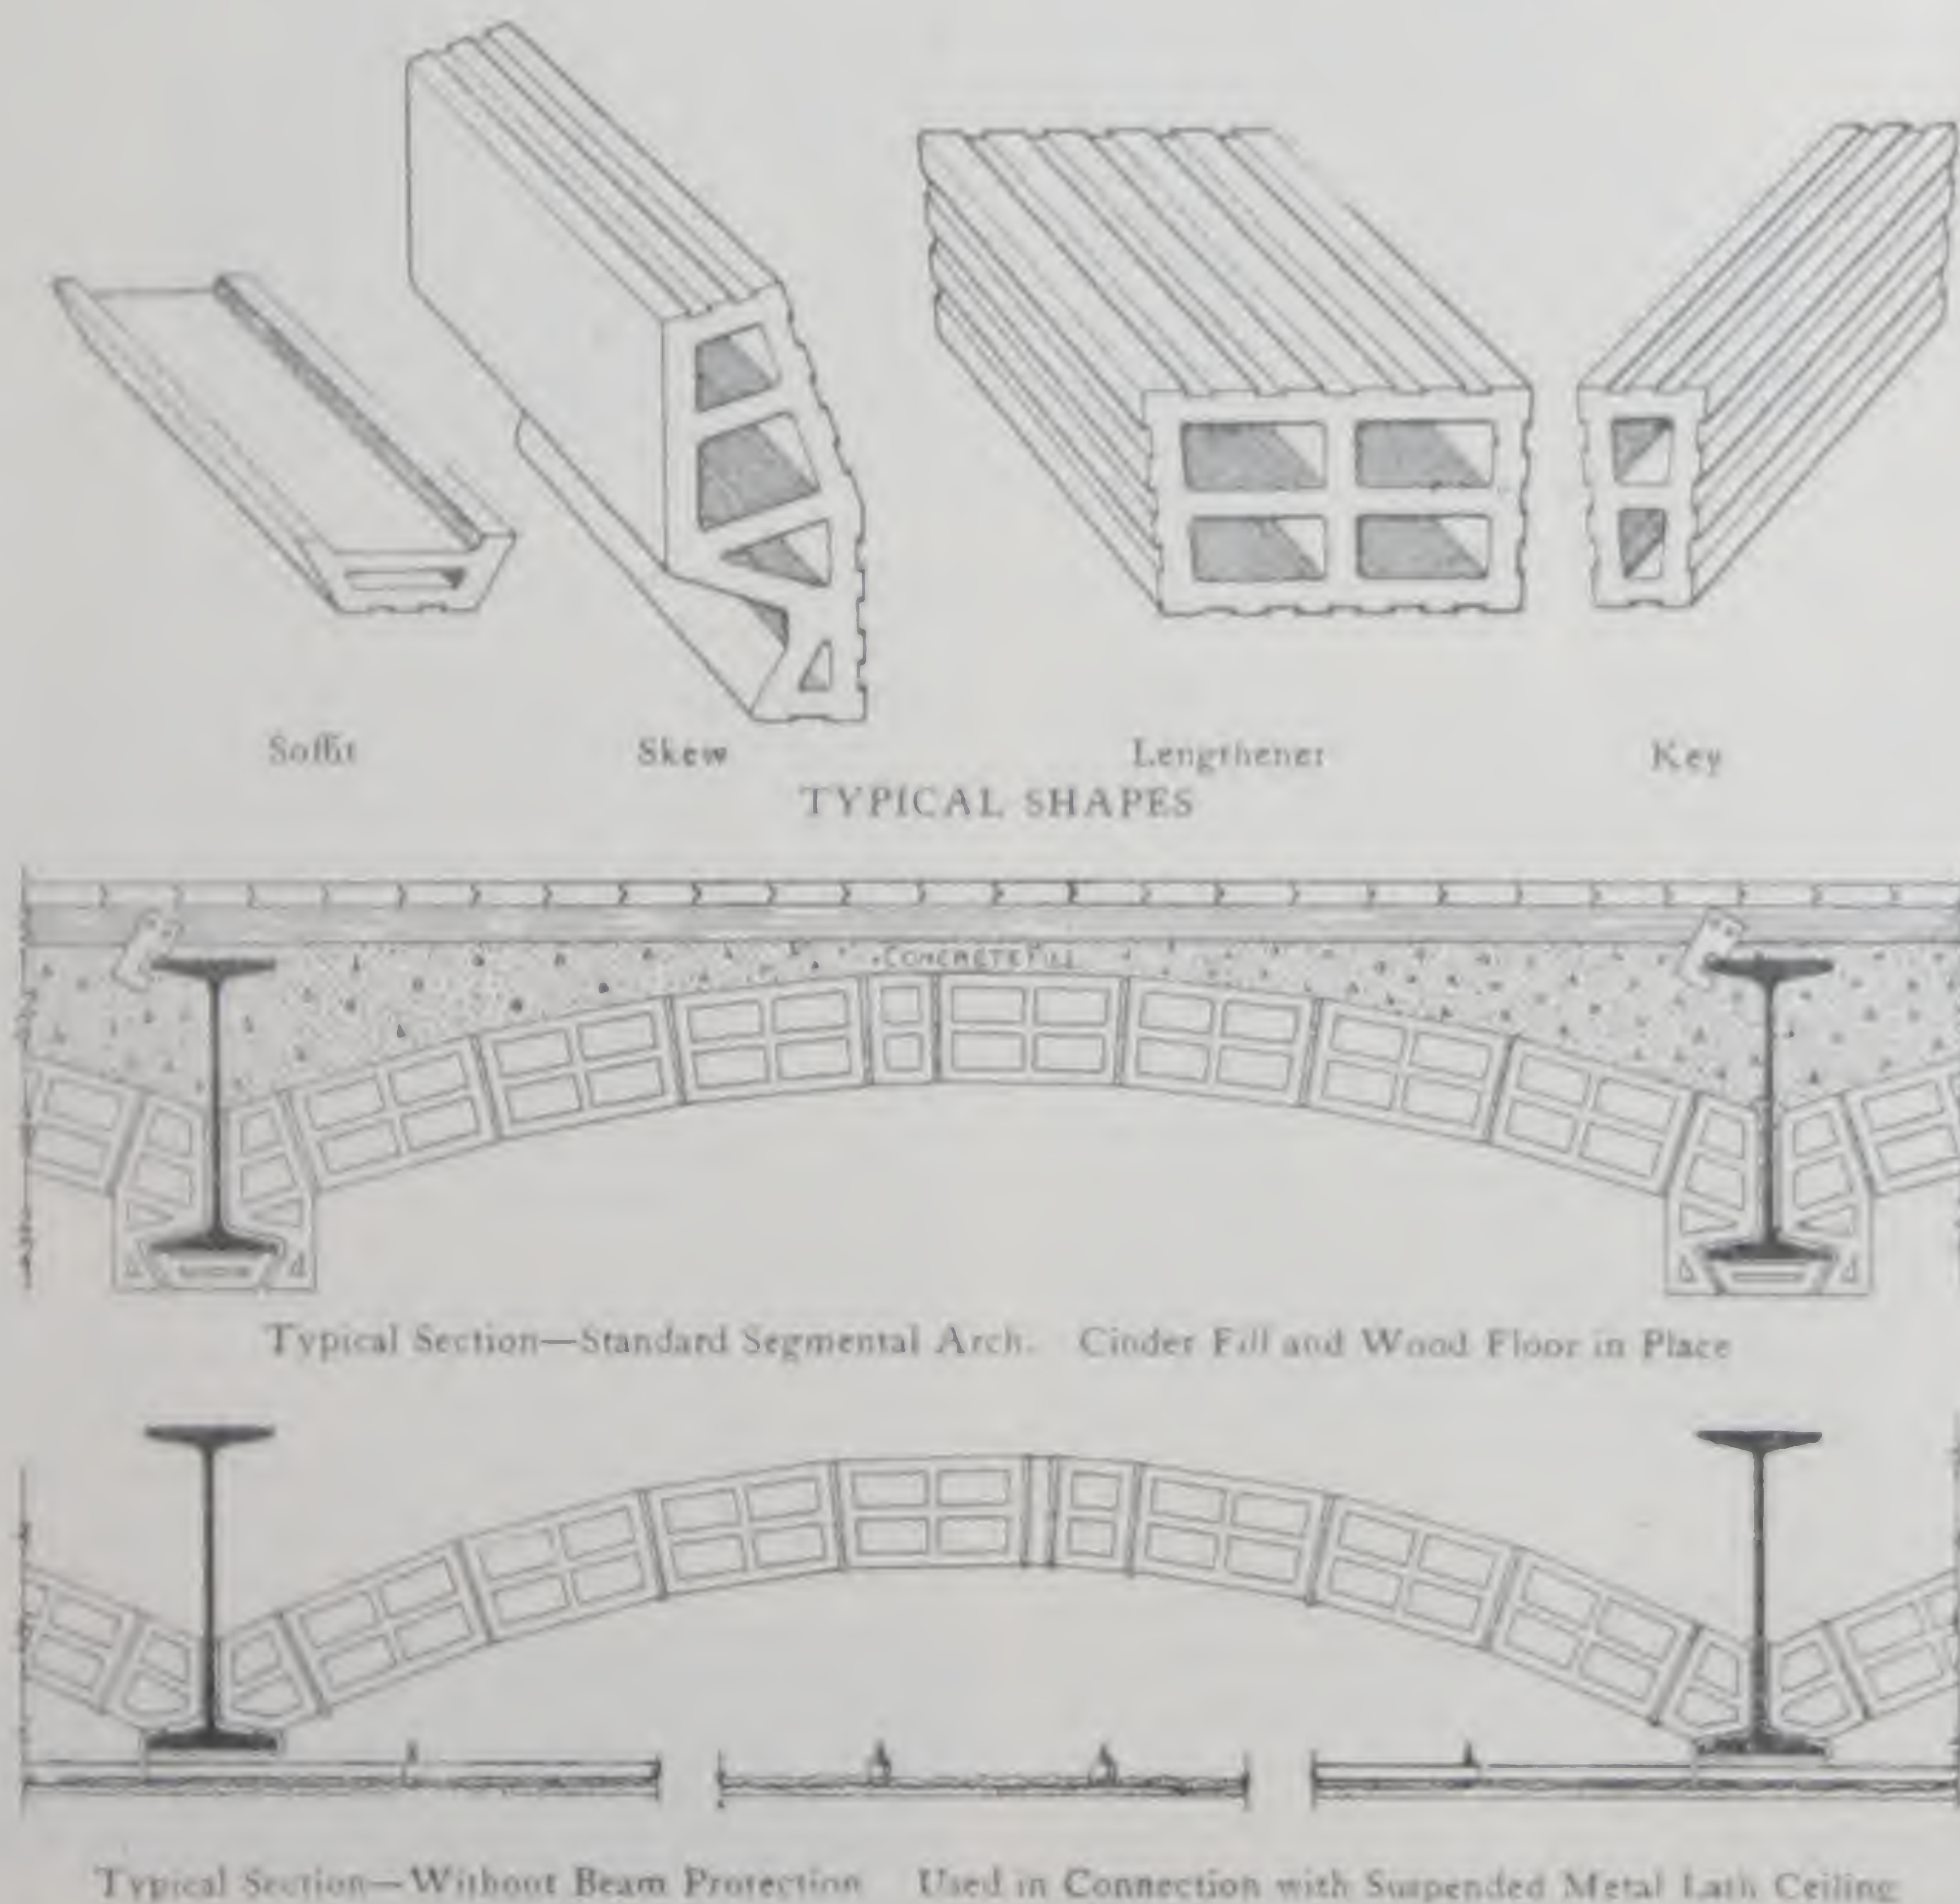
SEGMENTAL TILE ARCHES HAVE GREAT STRENGTH BUT HAVE CERTAIN DISADVANTAGES IN CONSTRUCTION.
